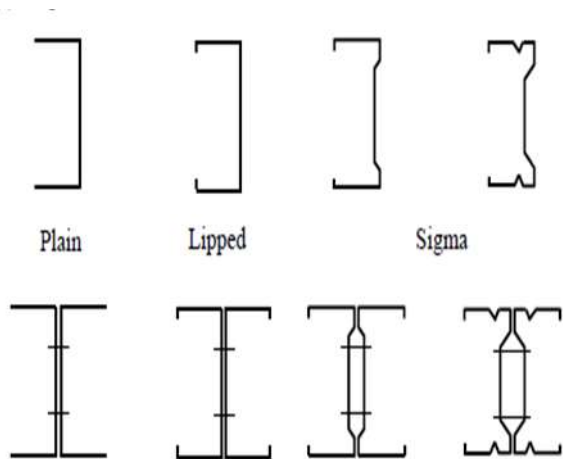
Cold-formed sections used in structural framing (Siang, 2009)
